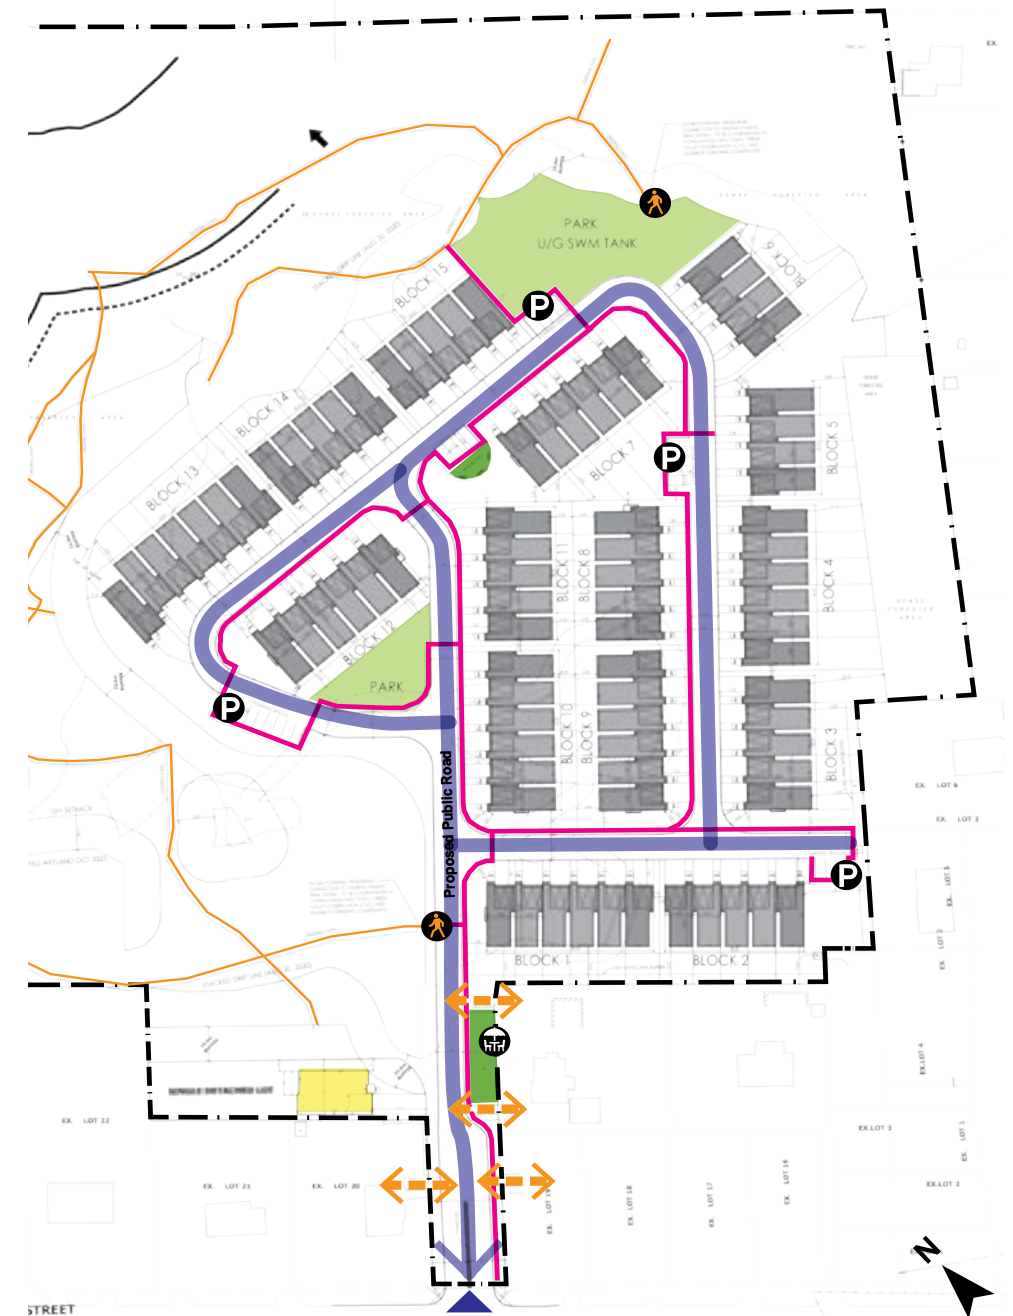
Site Circulation Diagram - Site Plan Prepared by RN Design and Annotated by Weston Consulting
